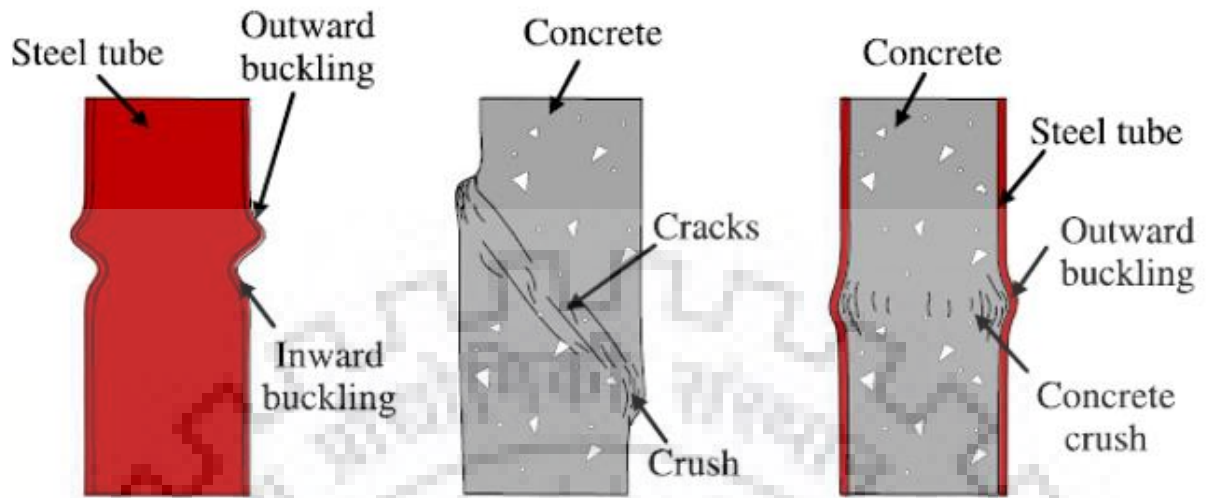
Failure of CFST column and corresponding Steel Tube and Concrete
